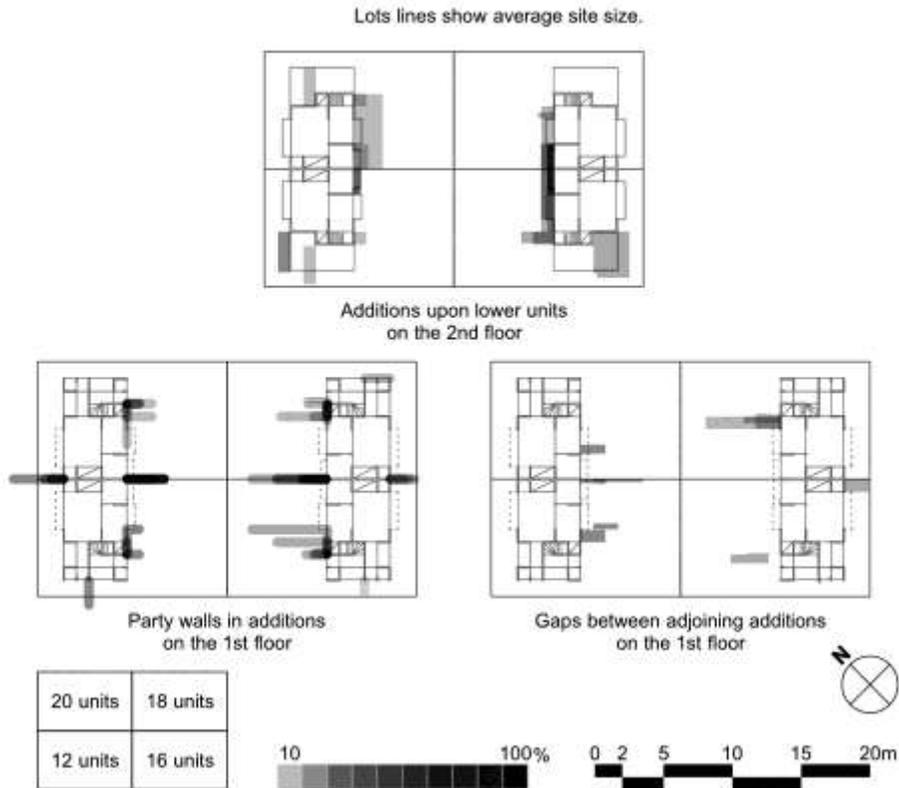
Superimposition of party walls in additions, gaps between adjoining additions and additions upon lower
